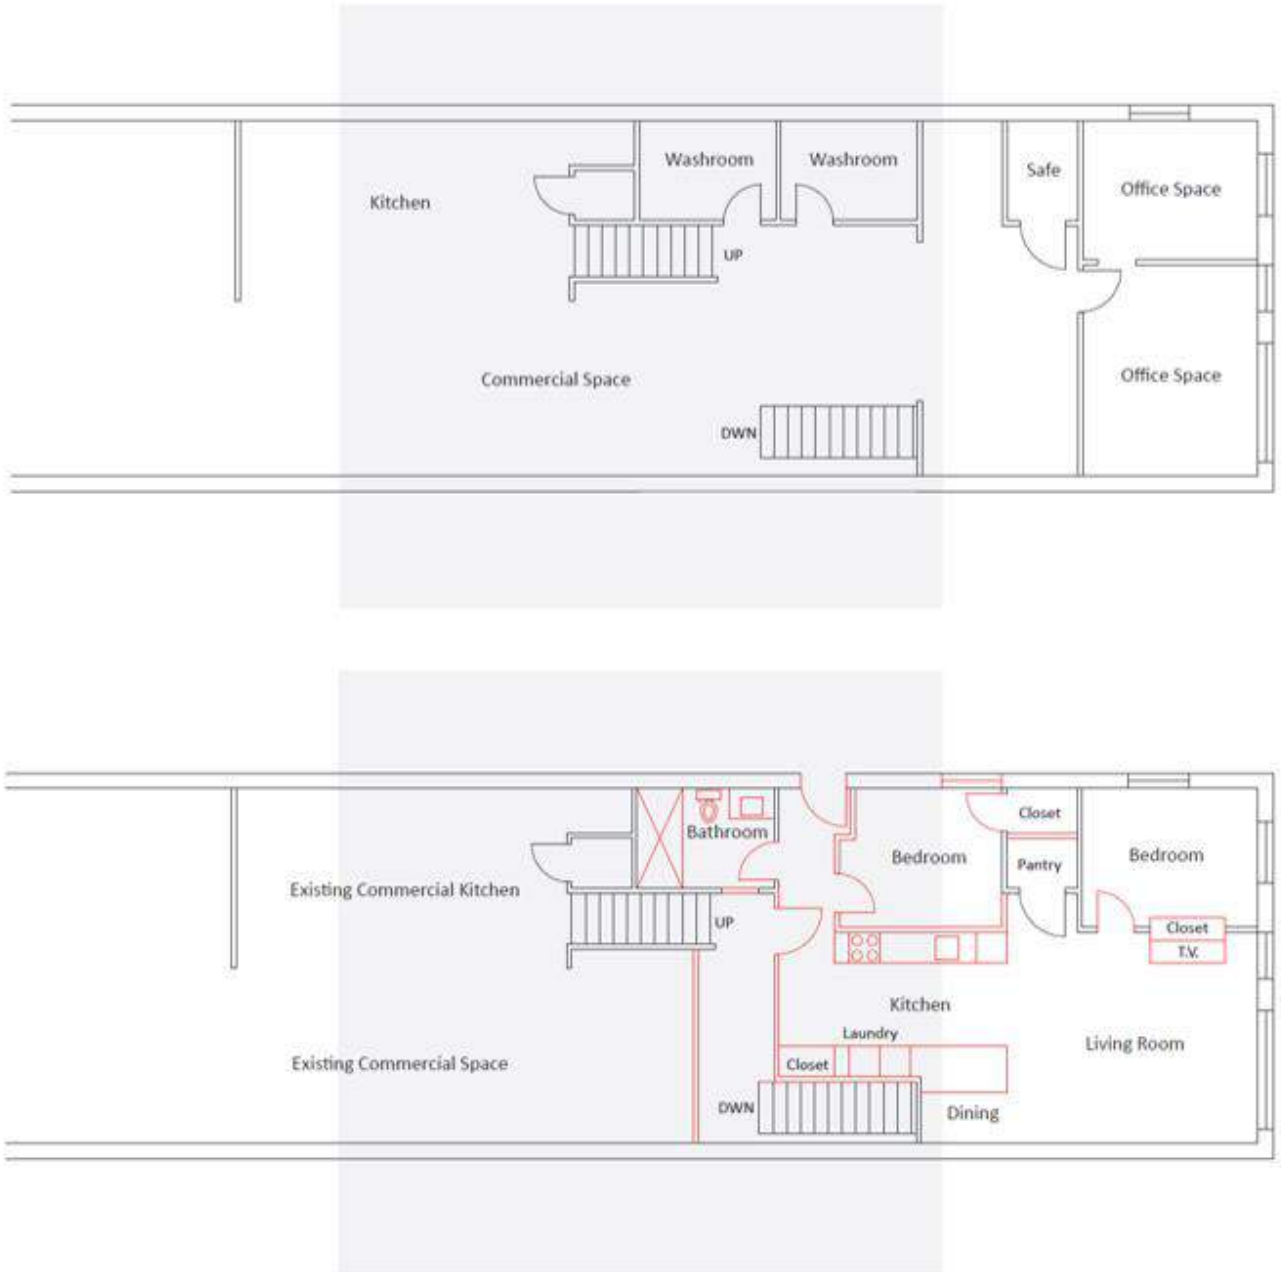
Existing and Renovation Plans of Lower Floor 18W 1st St, Duluth MN.
